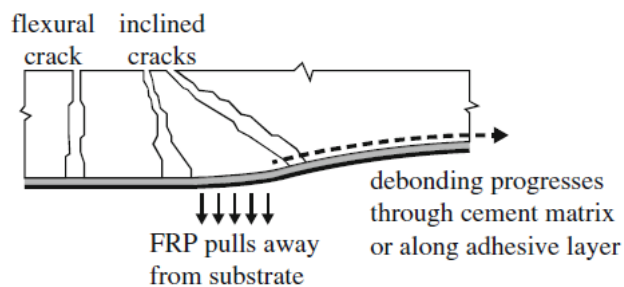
FRP plate debonding caused by shear or flexural cracks [23].
